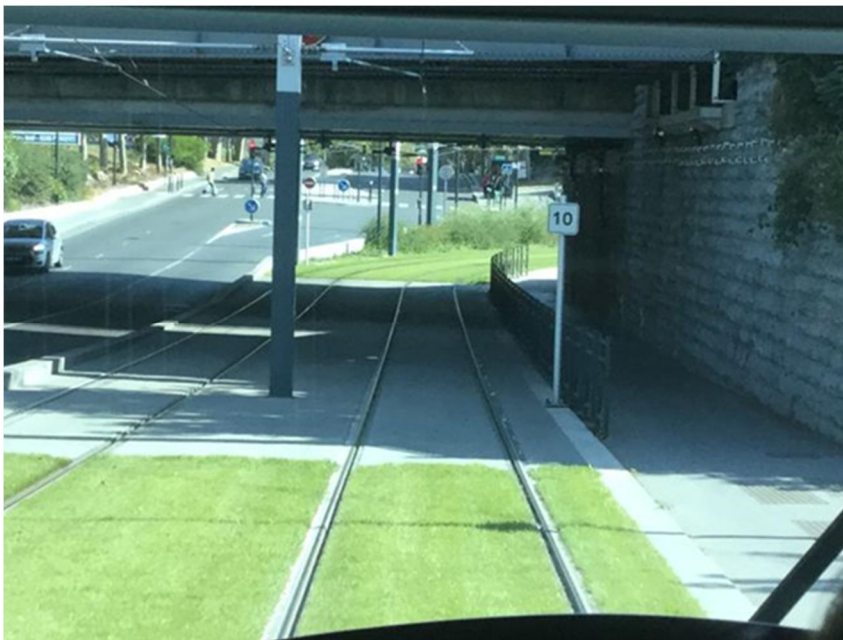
Example LRT line under overpass with vertical RE wall abutment (Paris T8)
